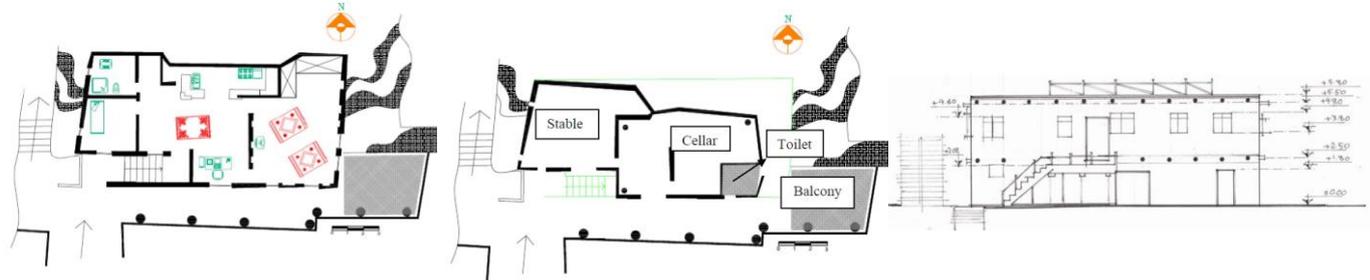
Plan of ground floor and first floor, and section of a selected house from Palangan village; left to right: Ground floor, First floor, Section (Authors)
